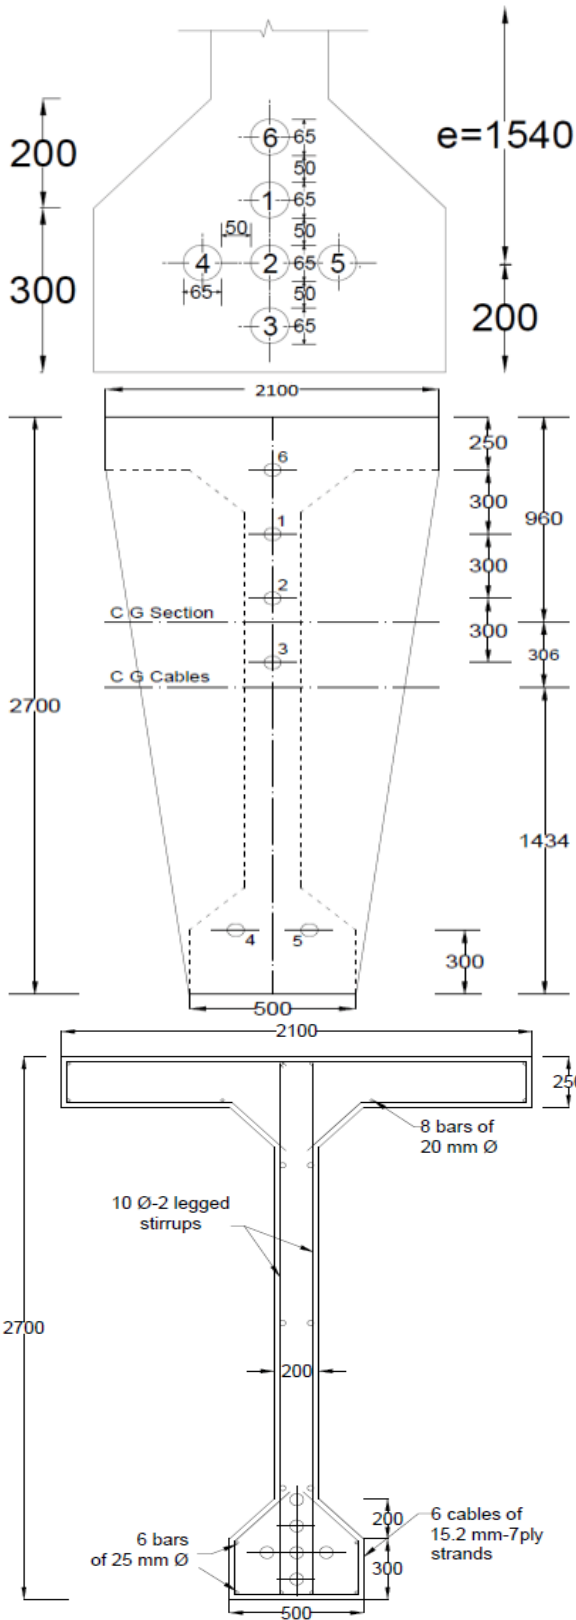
Arrangement of cables at centre of span and support section and reinforcement at centre of span (for effective span 45m)
